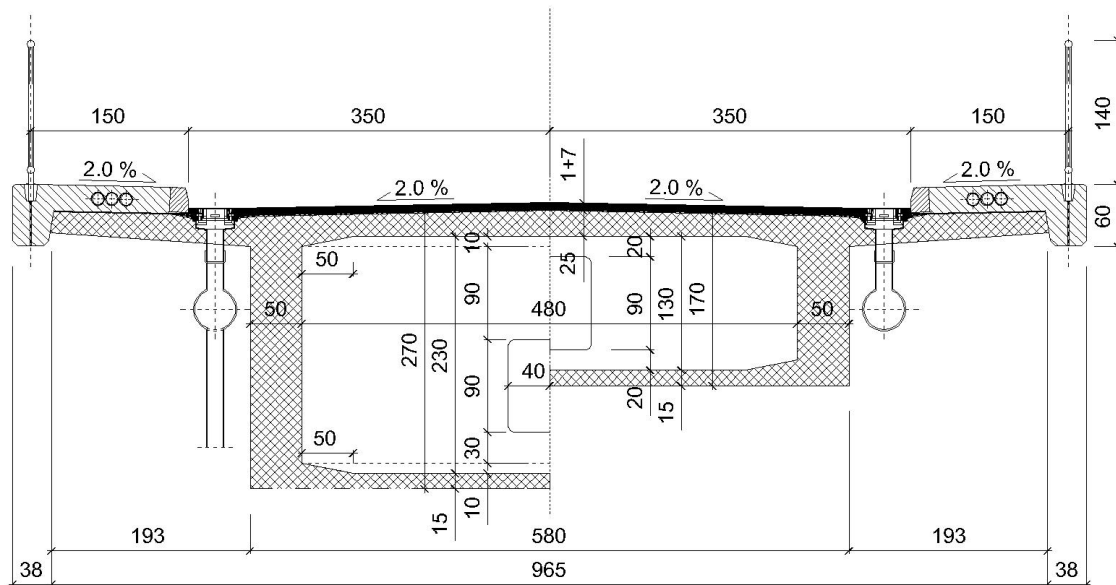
Upper deck cross-section of bridge models (M1, M2 and M3)
